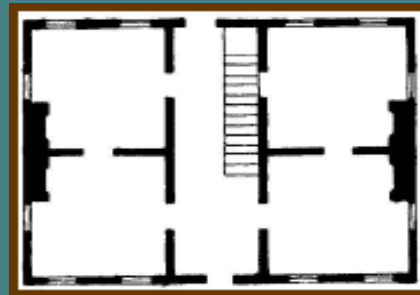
Fig. F. Typical "Georgian" floor plan of four main rooms divided by an entry/stair hall.
